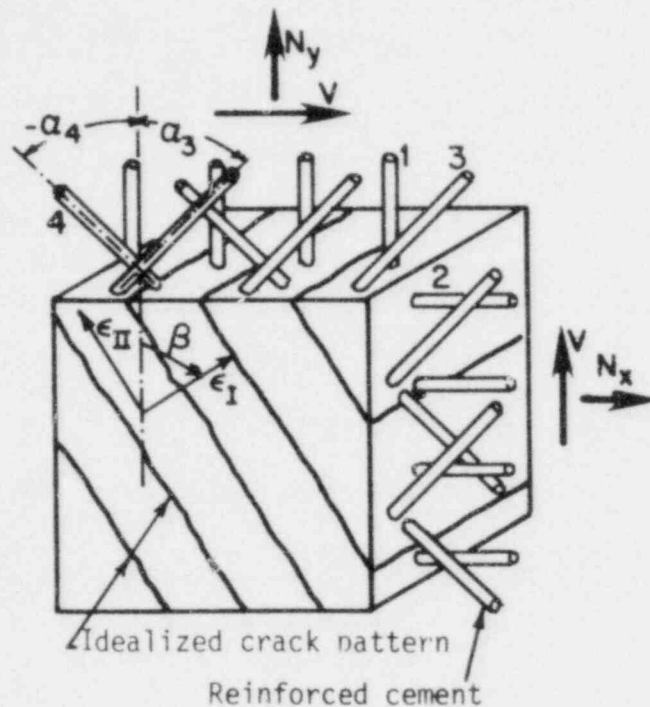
Typical cracked reinforced concrete wall element (Ref. 29).
